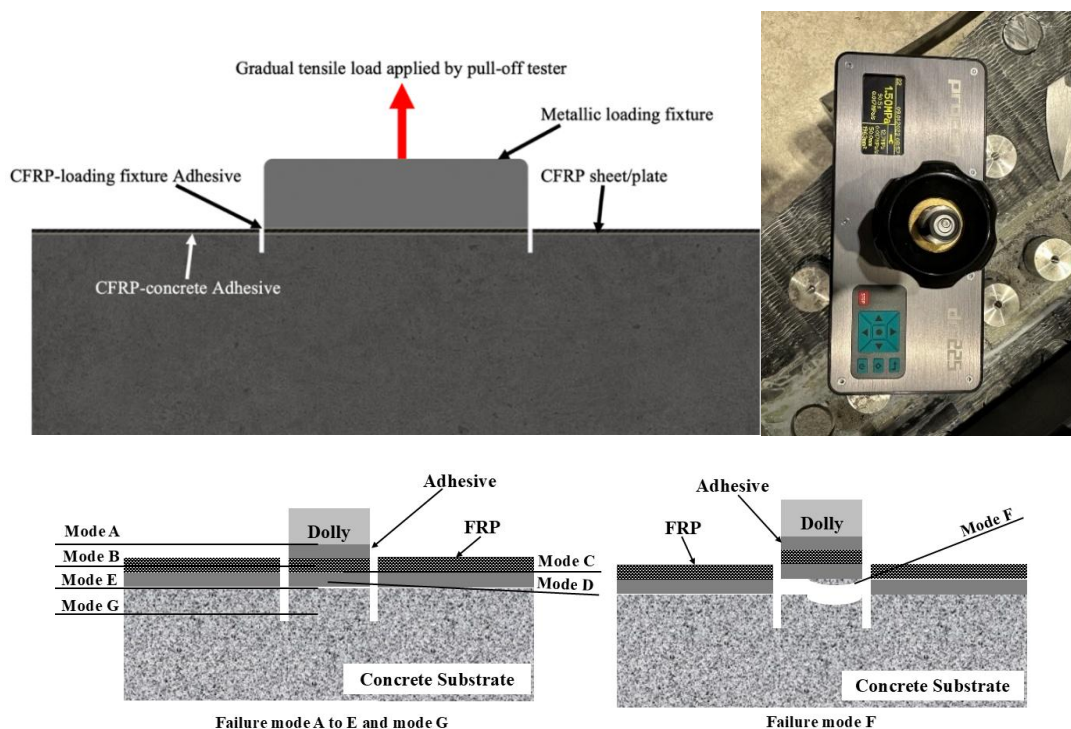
Pull-off testing set up a) Loading direction b) Pull-off testing apparatus c) FRP-concrete bond failure modes under pull-off test (ASTM 2021)
